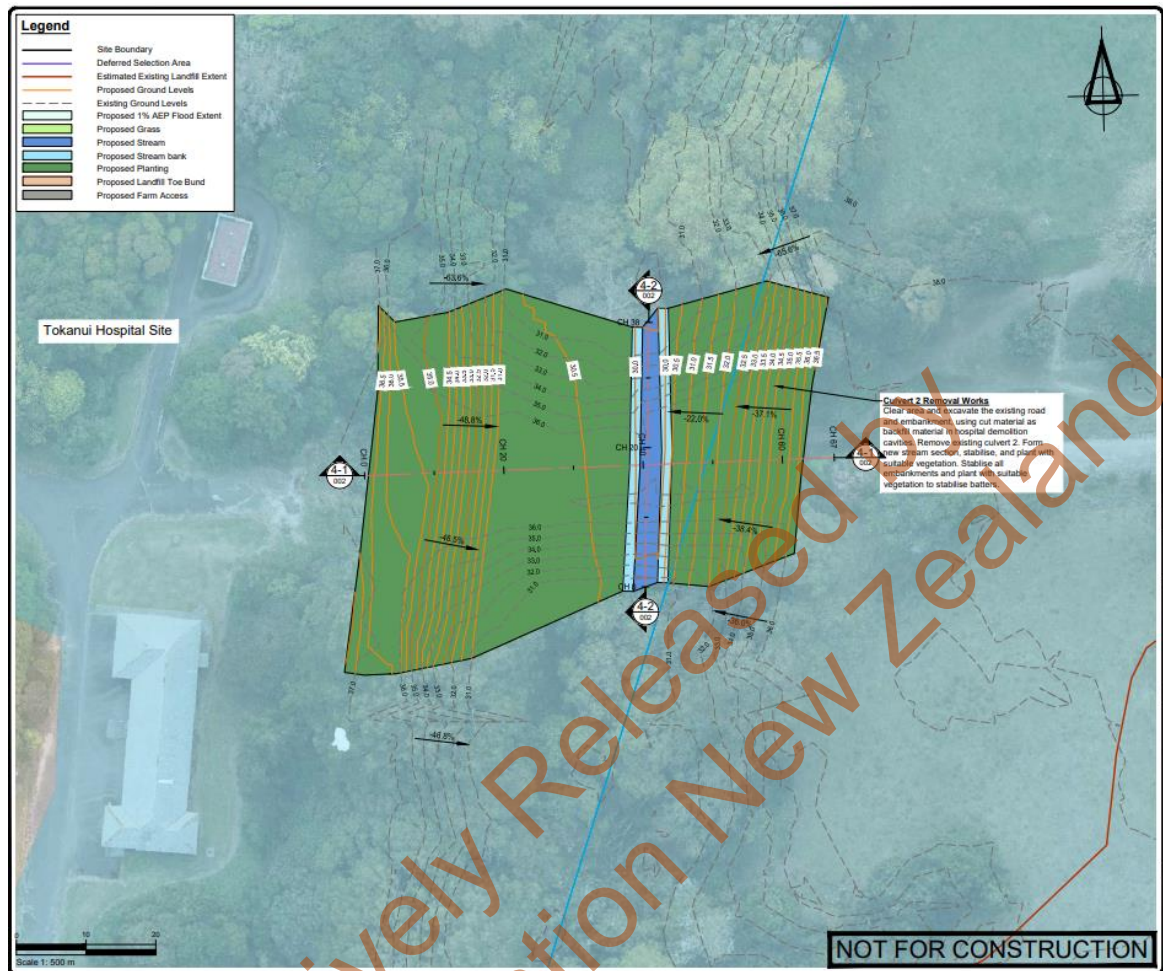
Proposed removal of road embankment and Culvert 2 intersecting the Wharekōrino Stream.
